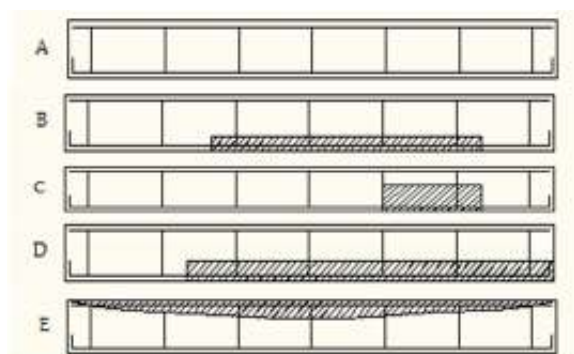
(A) Reference beam; (B) Partial tensile damage; (C) Shear damage; (D) Full tensile damage; (E) Compression damage.
